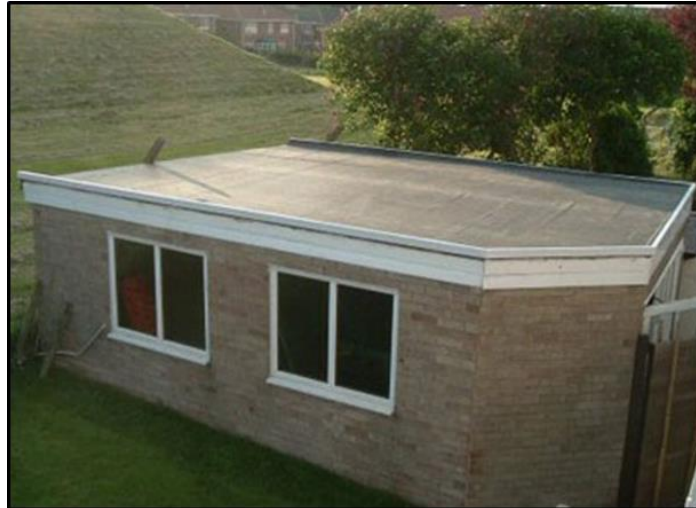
Concrete flat roof structure. [Adopted from (Chelas Roofing 2007).]
